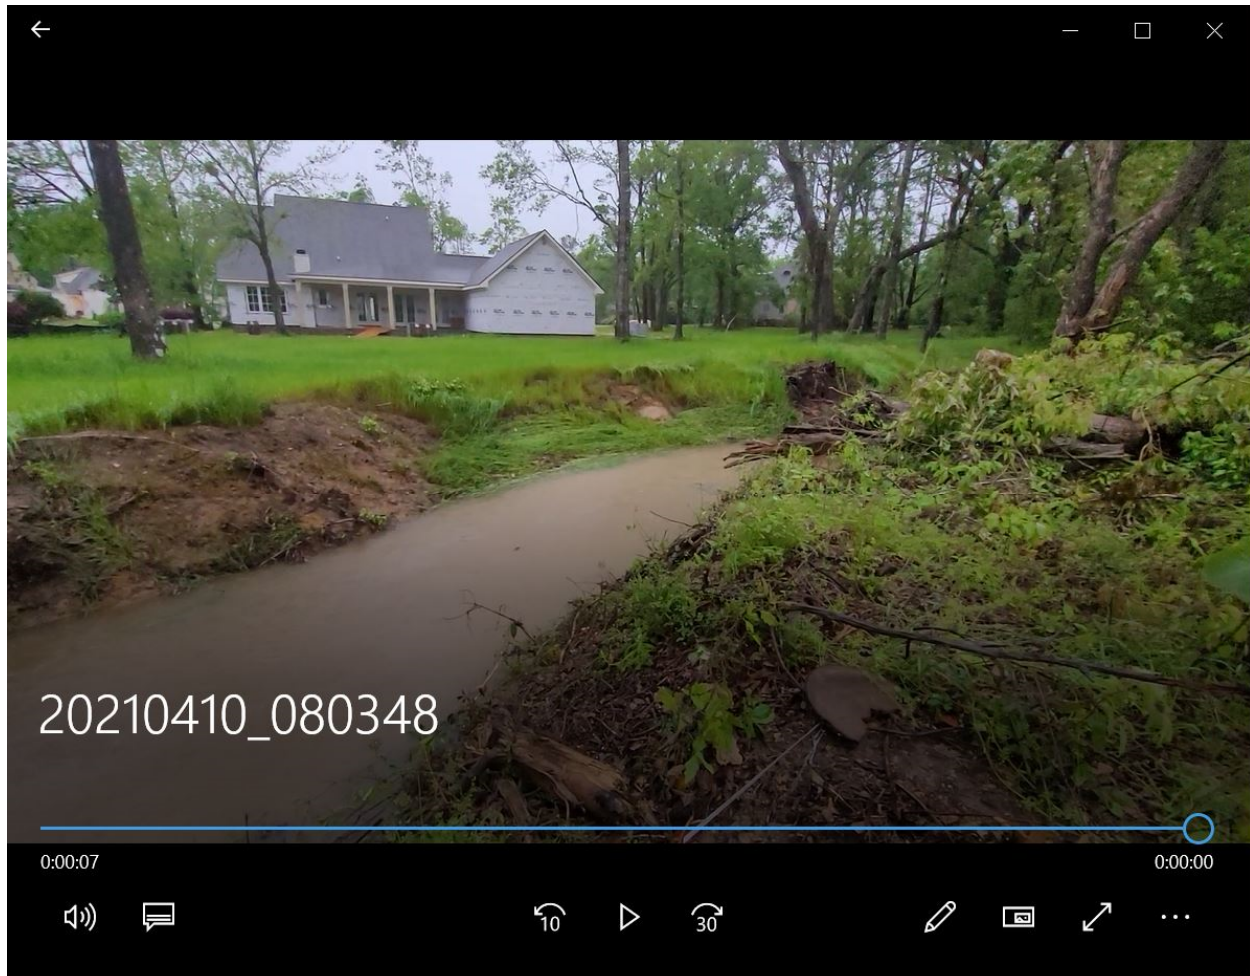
Flooding behind Polo Ridge from adjacent subdivision.
